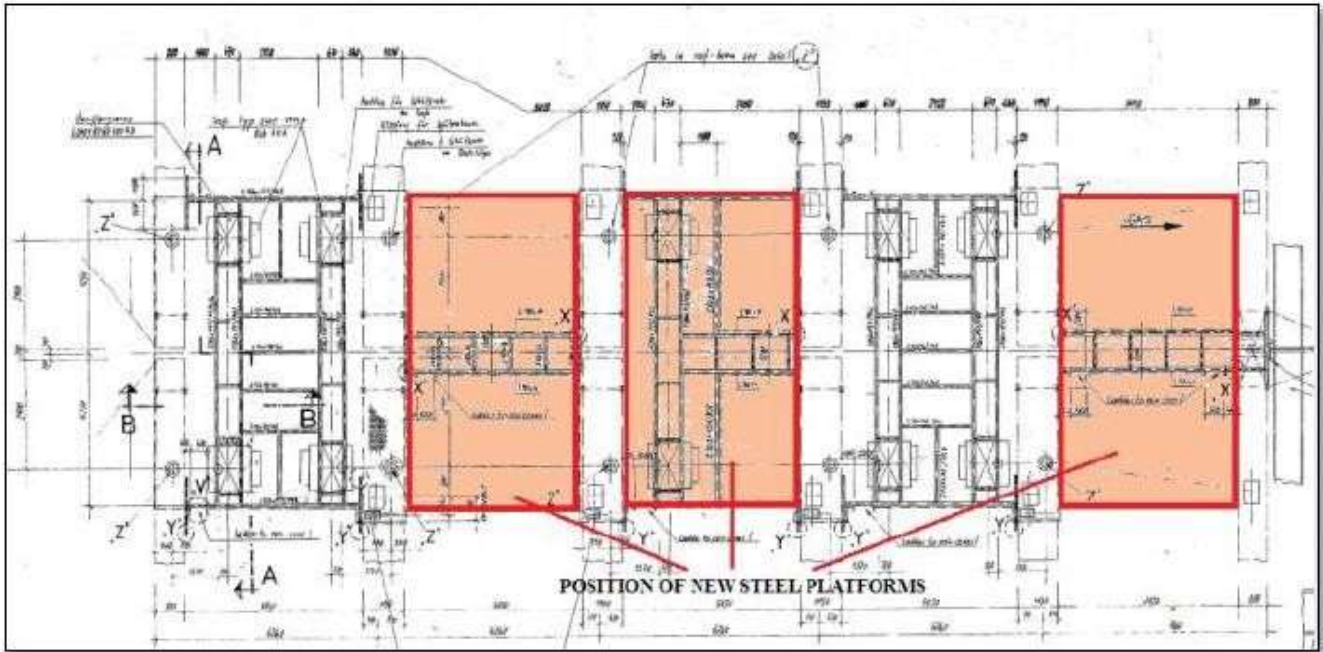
Position of new steel platform (extract from drawing no. 0.61/08996 Rev. 2)
